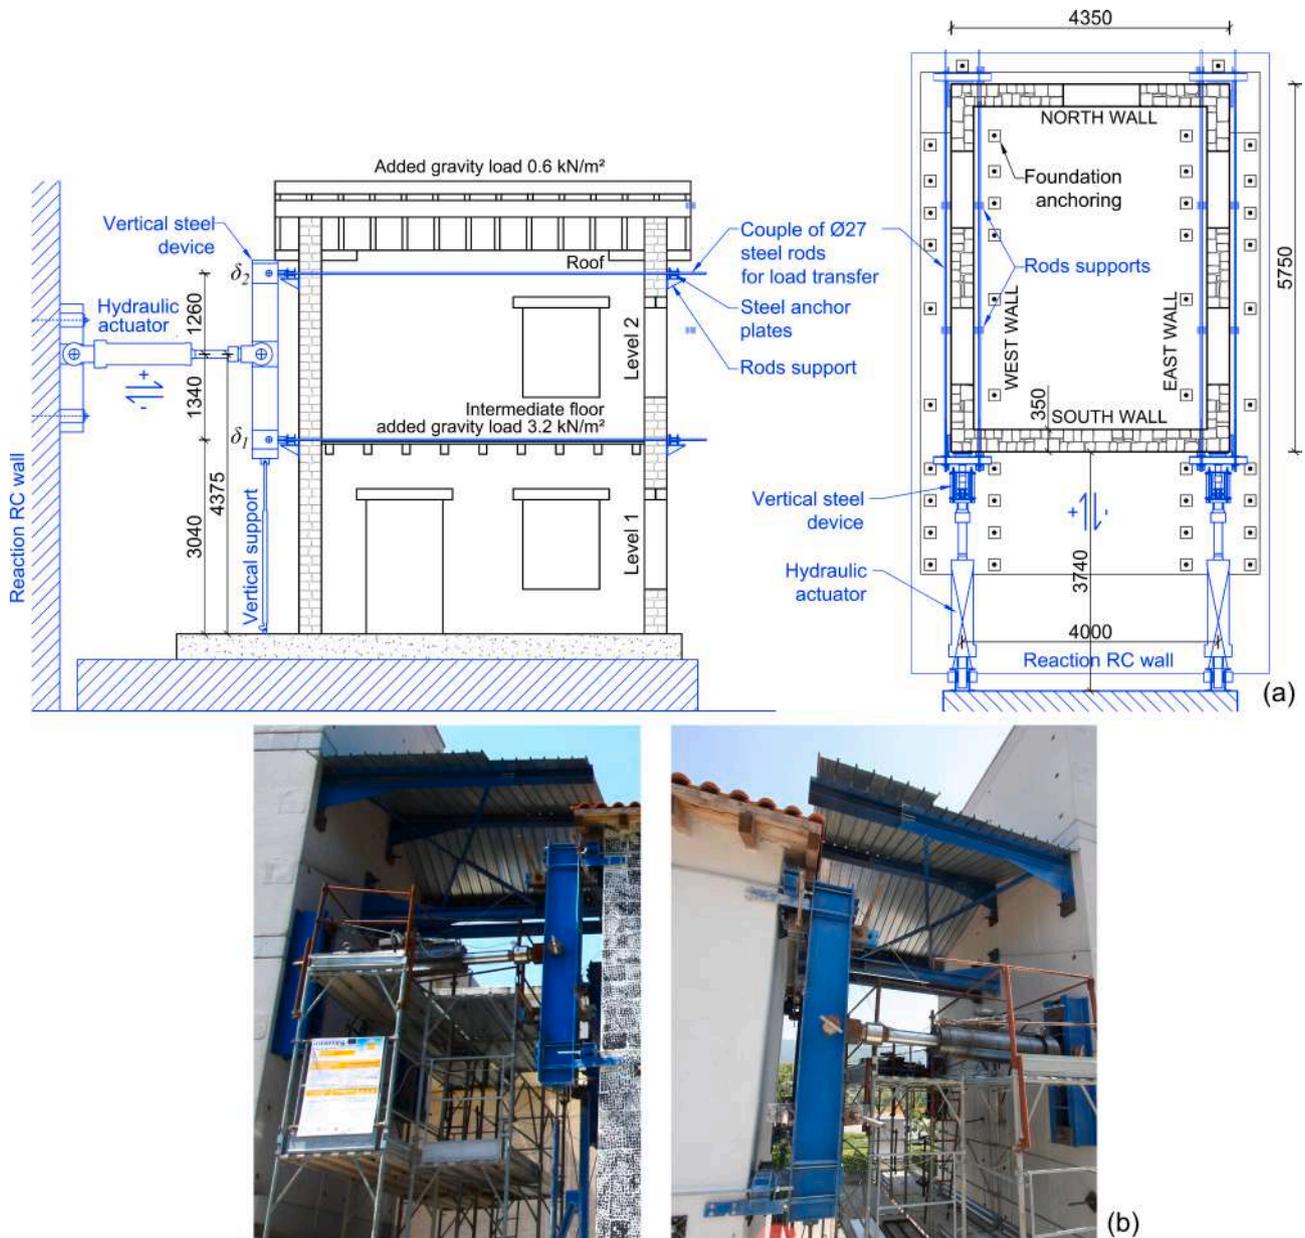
Loading apparatus: (a) schematics section and plan view (dimensions in mm); (b) actual view.
